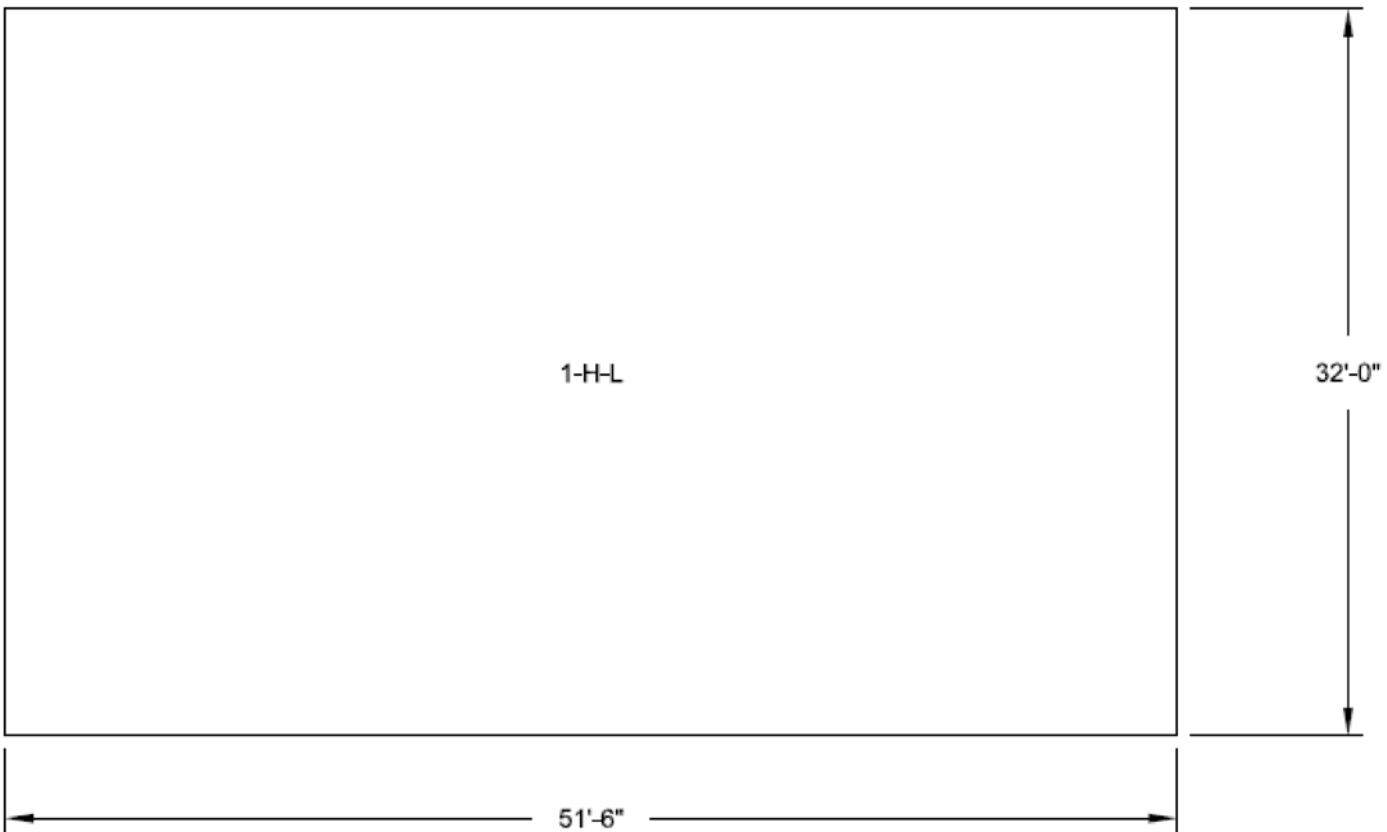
H.6-149 DGFOV Roof 2 Looking Down Horizontal Reinforcement Zones Far Side Face
